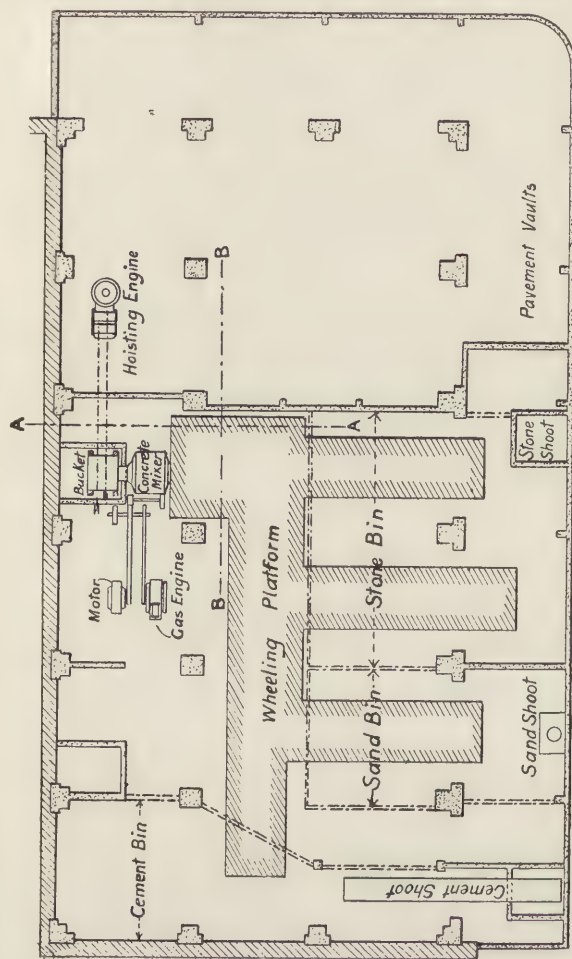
Plan of Basement, showing Concrete Plant and Storage Bins.
